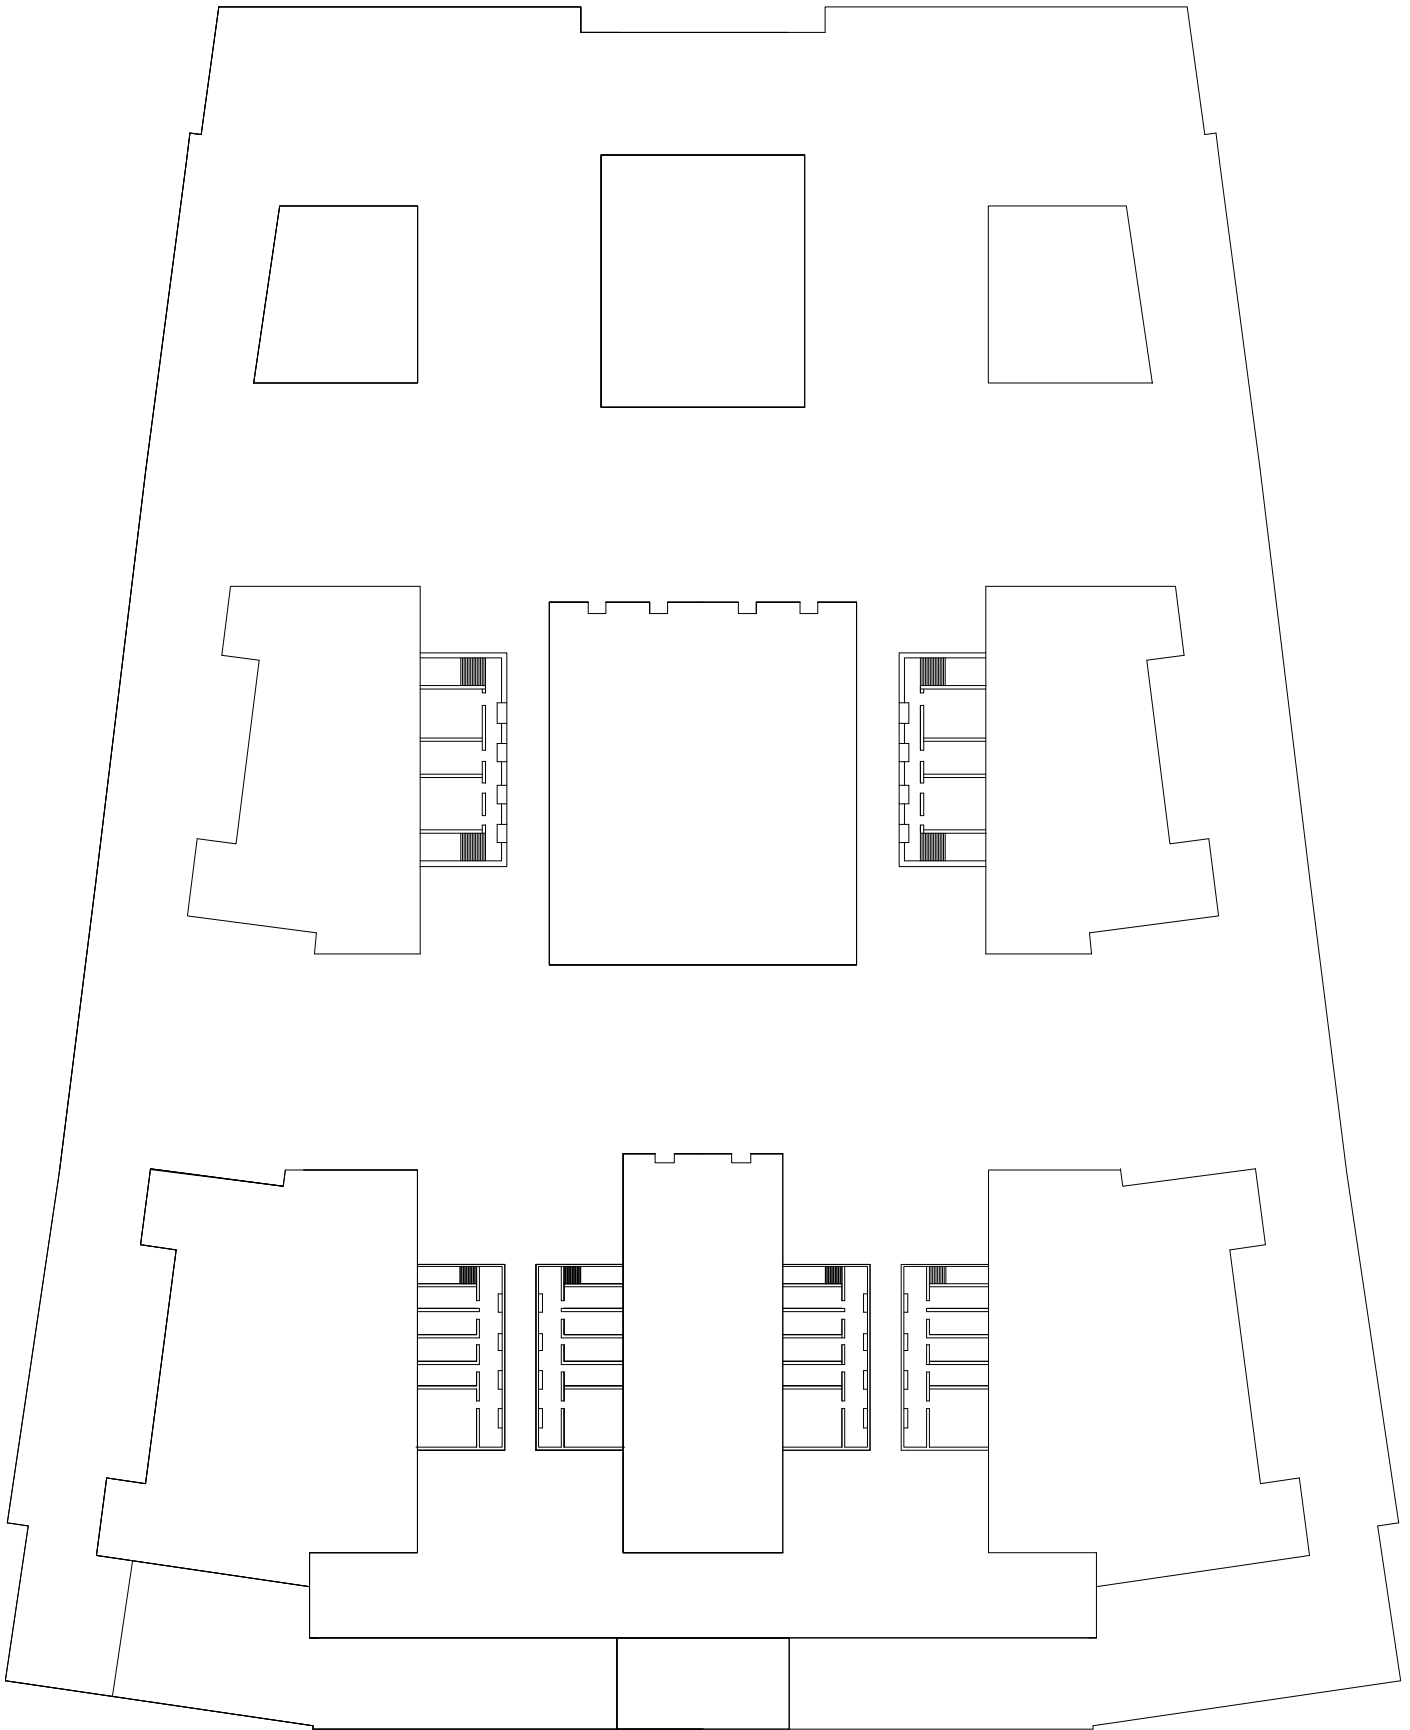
Second Floor Mezzanine Plan, limited to a few premises extending to a limited portion of the noble first floor.
